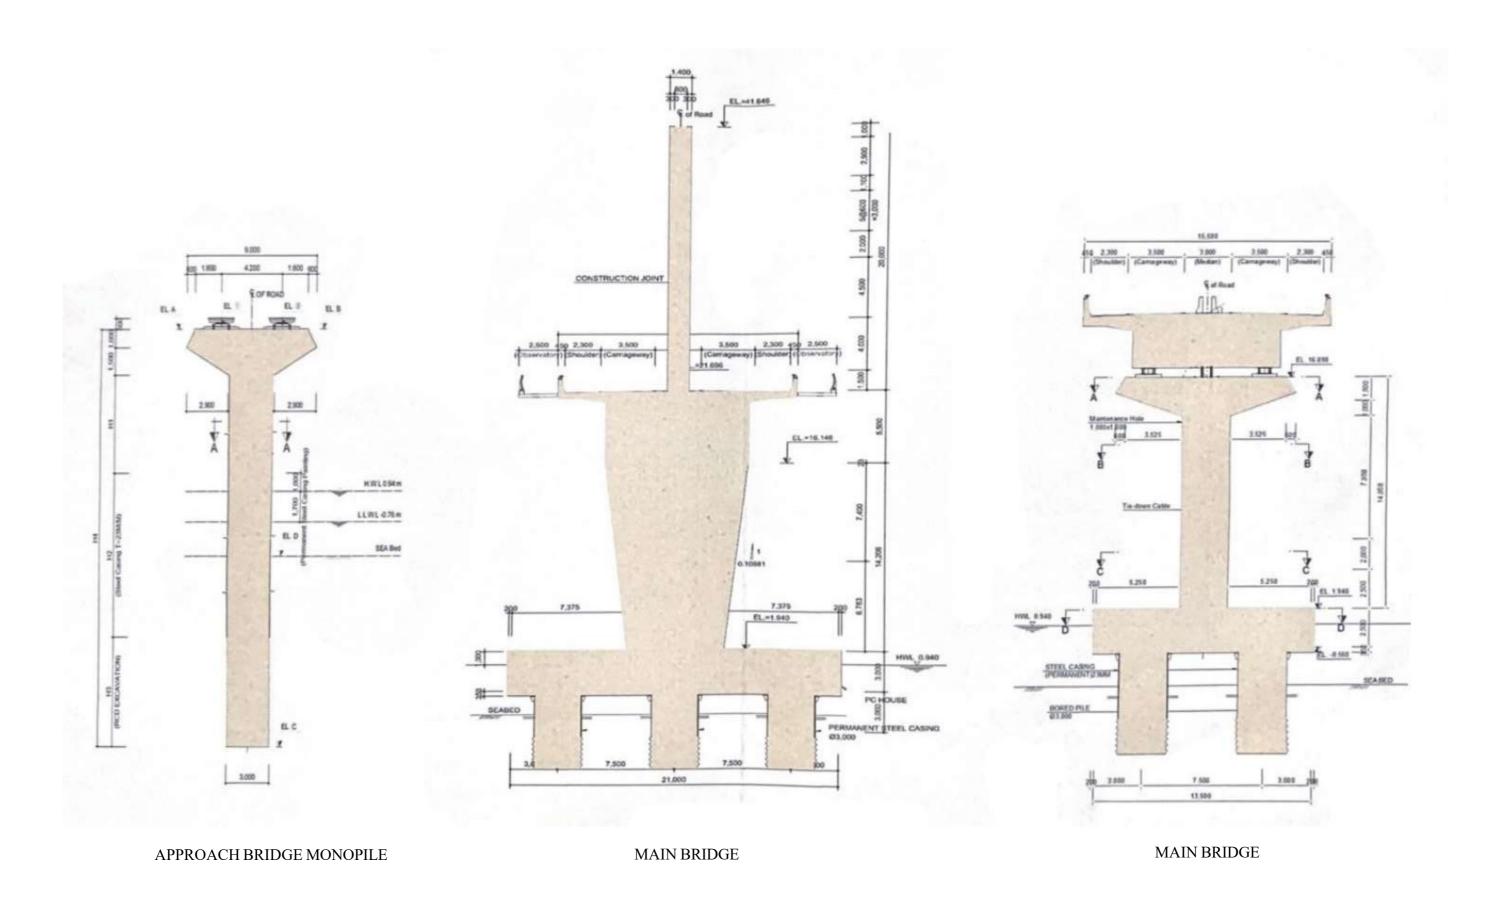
DETAILS OF THE PIER/APPROACH/MAIN BRIDGE
